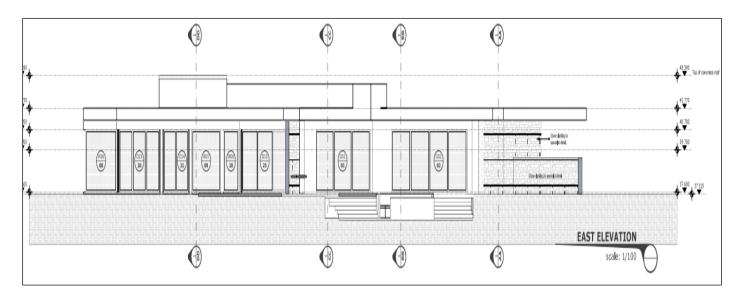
East elevation of the proposed entertainment facility (TMBA, 2018)
